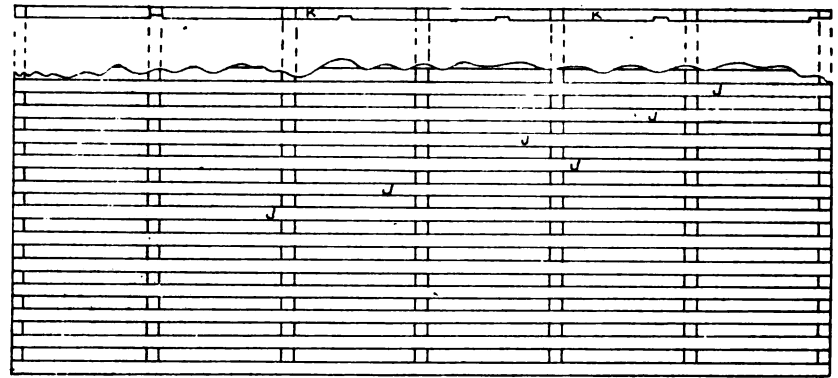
SHOWING A PLAN OF THE TOP ROOF
